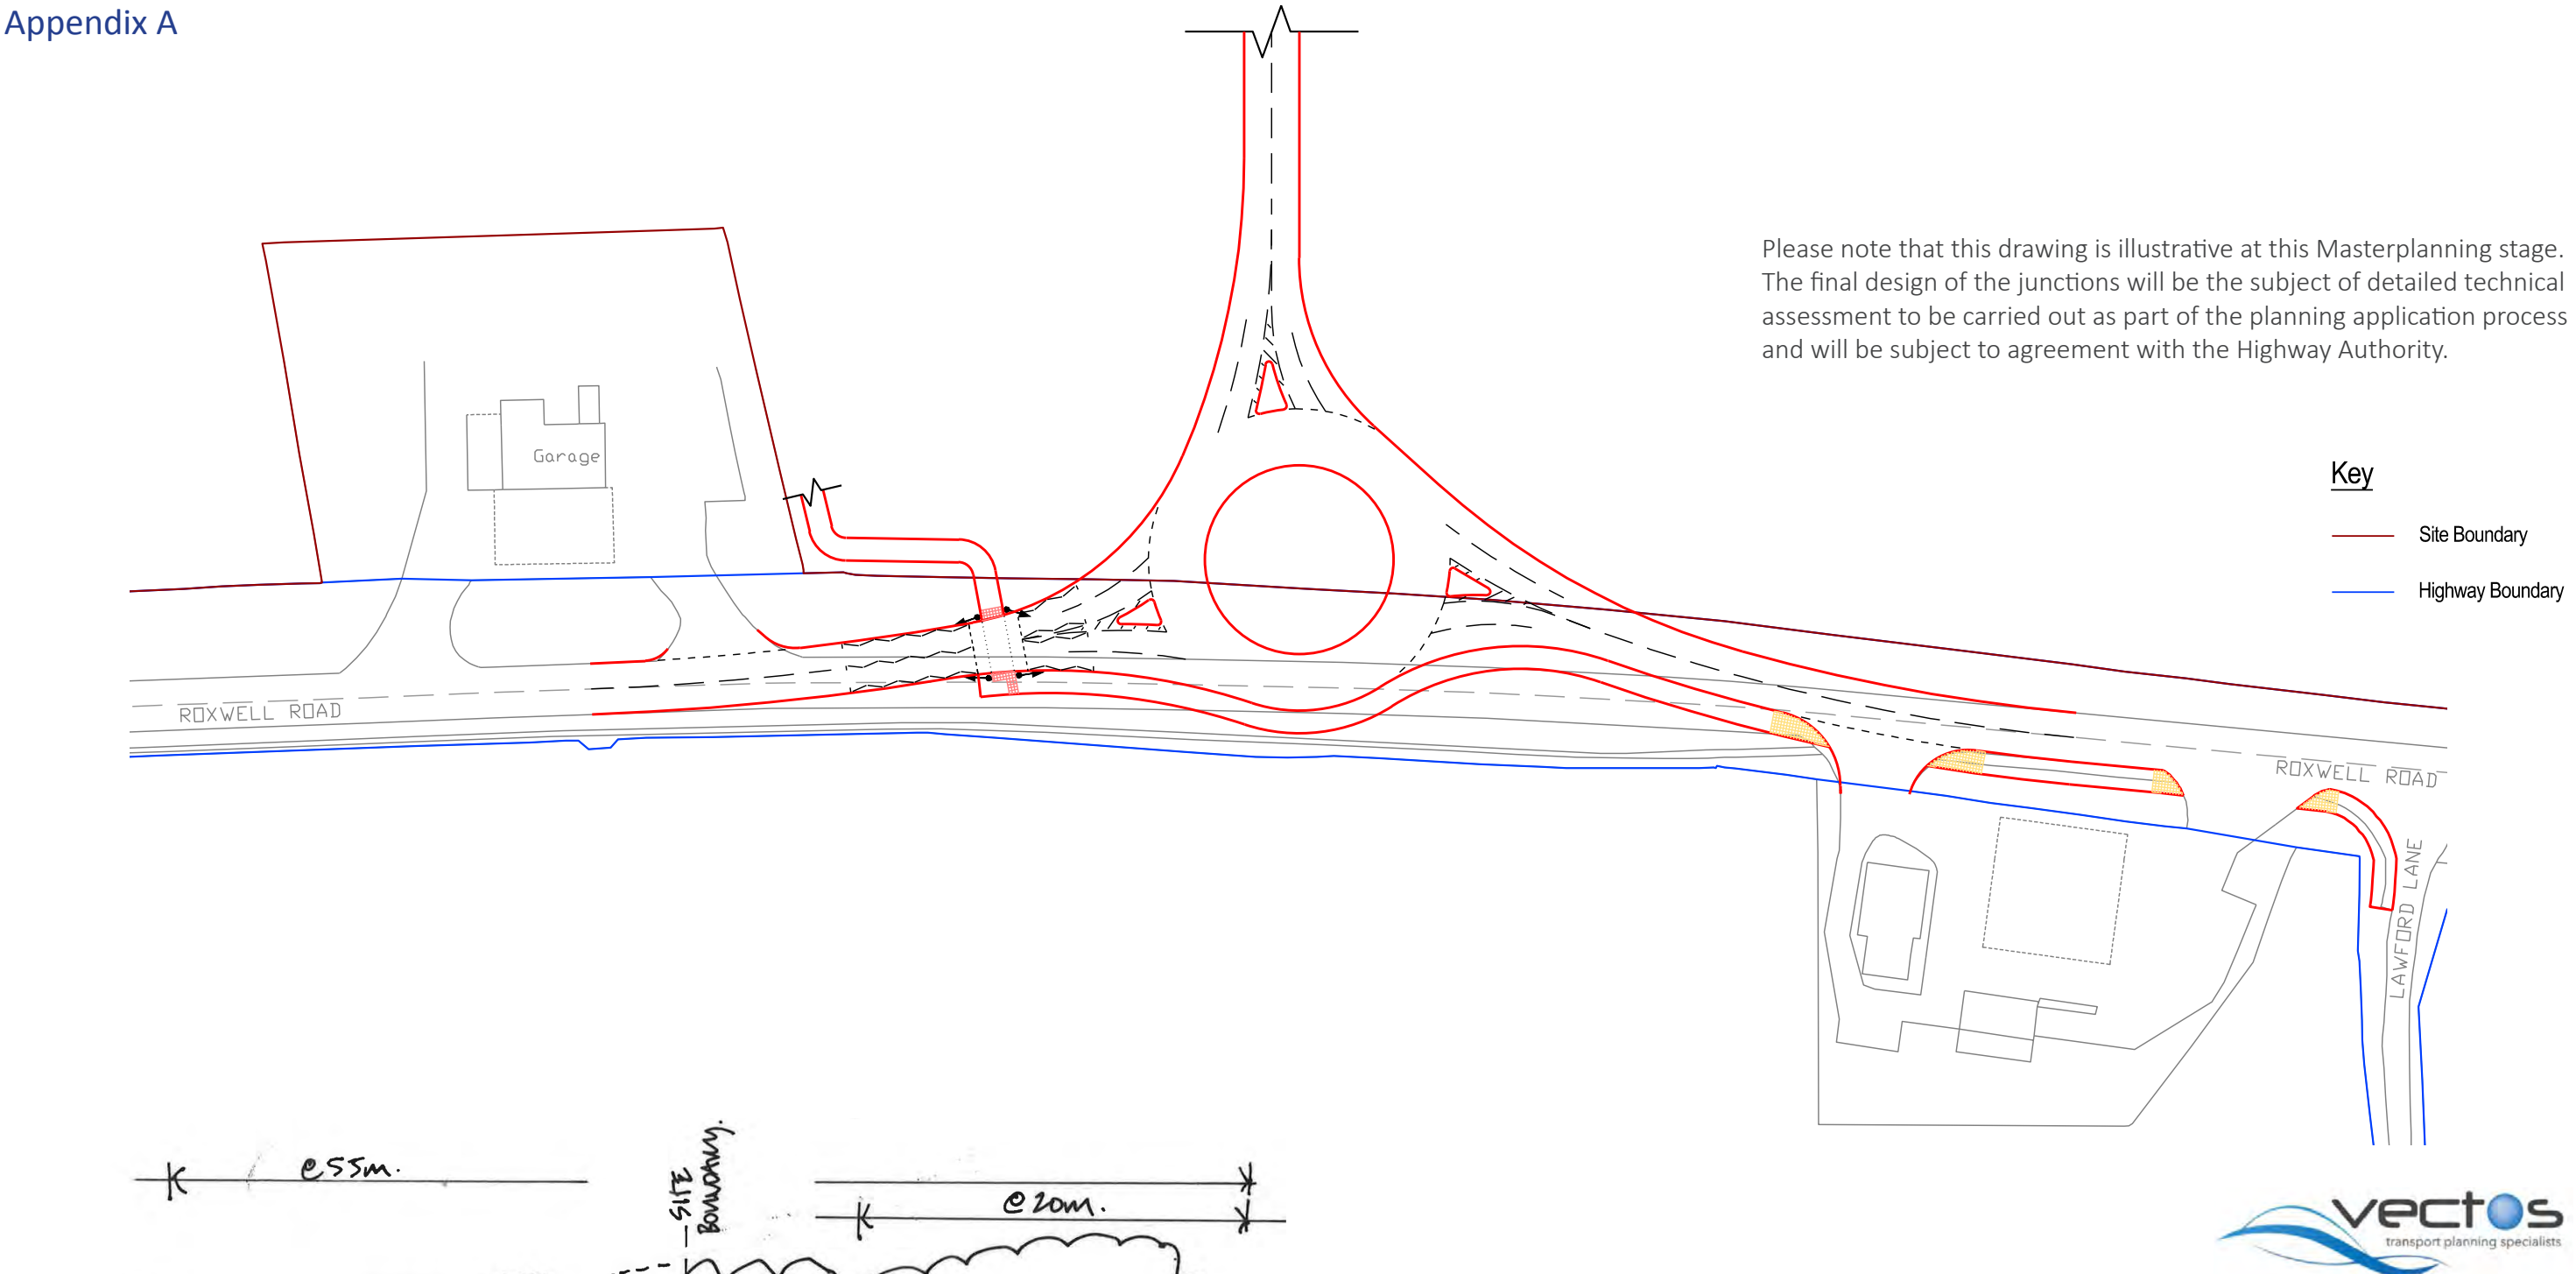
A new roundabout will feature a pedestrian crossing allowing pedestrians and cyclists to cross Roxwell Road.
